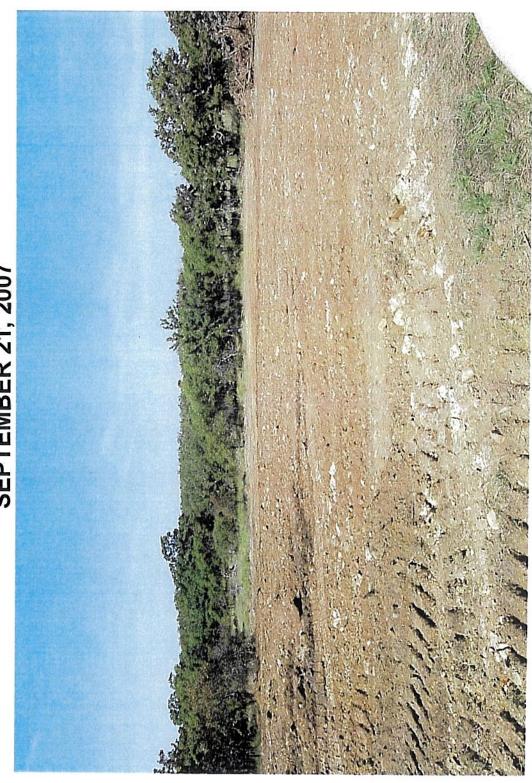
taken west. Location cleared for drilling. Some wet spots were pits were filled in.
